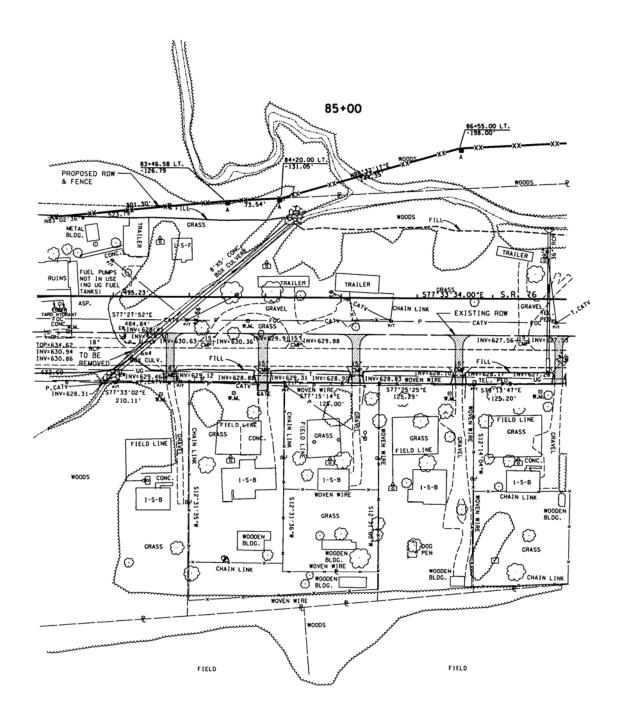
A-4. Portion of Present Layout Sheet (Box Culvert)
